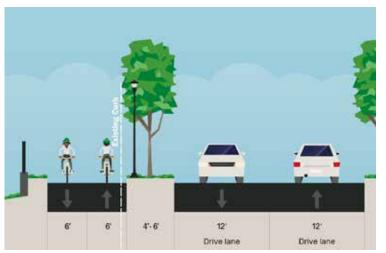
Segment 5 narrow right of way and retaining wall needs.
